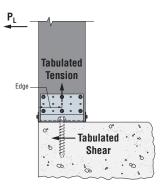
A-1 Single Anchor — One Anchor Shear, One Anchor Tension (tension from moment created from P_I)
